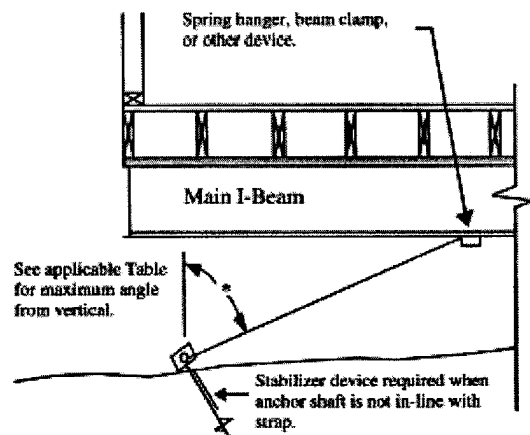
Connection to existing spring hangers, factory installed or site installed beam clamps.
